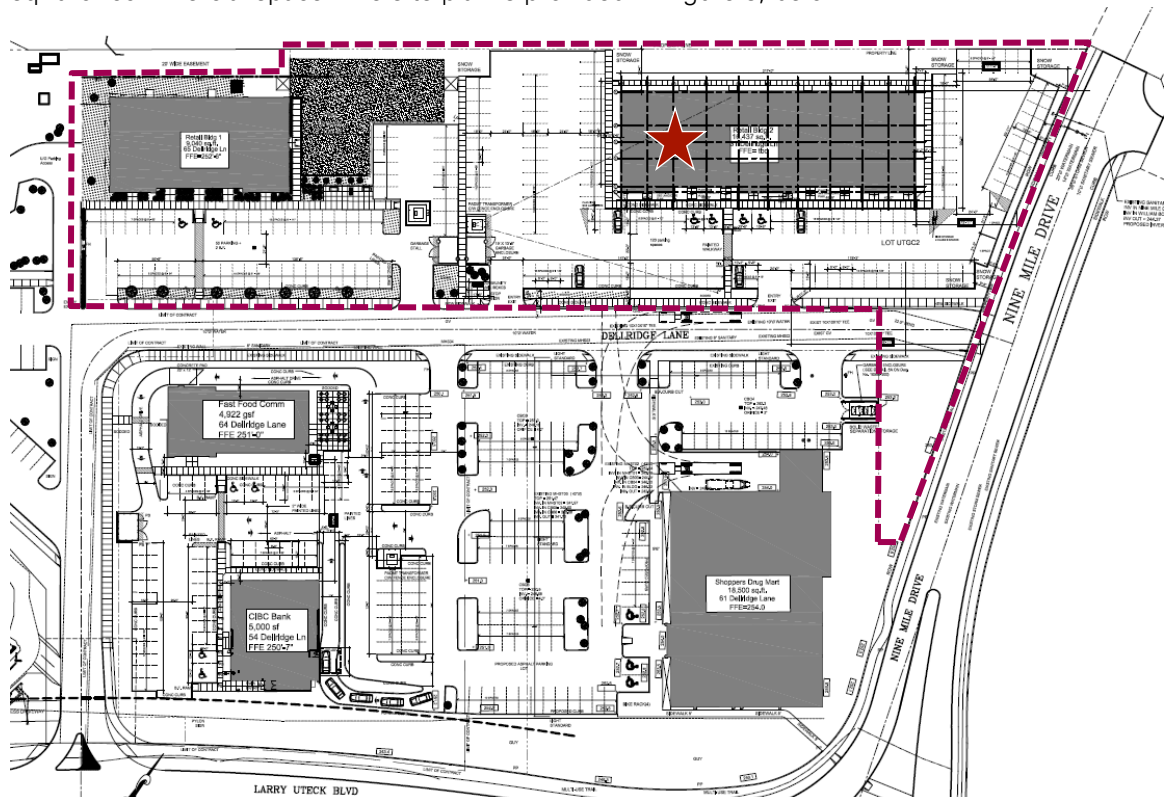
Site plan with property line indicated ((Source: Issued for Construction Drawings, Dated July 23, 2013)
